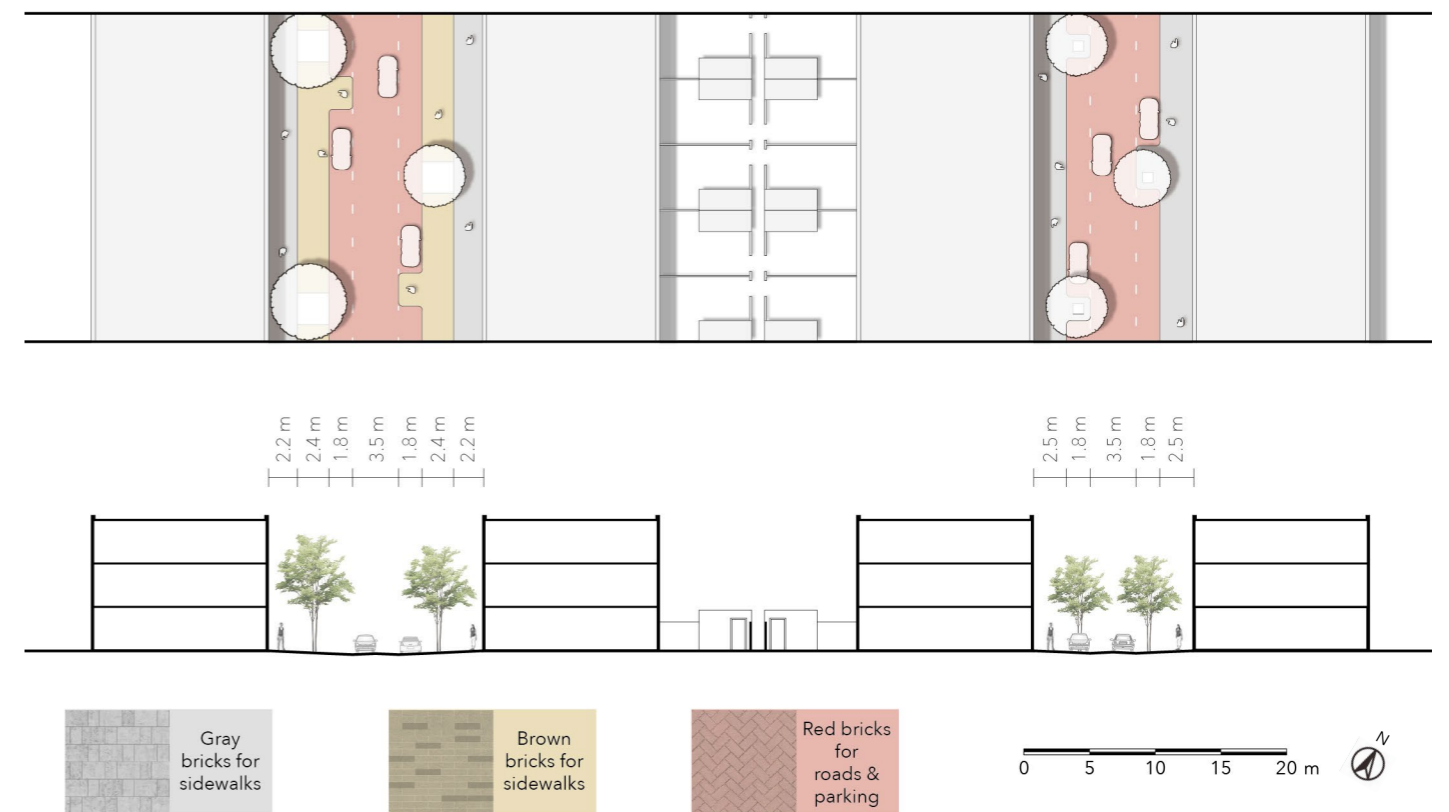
Conceptual plan and section of the current situation of the wide street (left) and narrow street (right).
